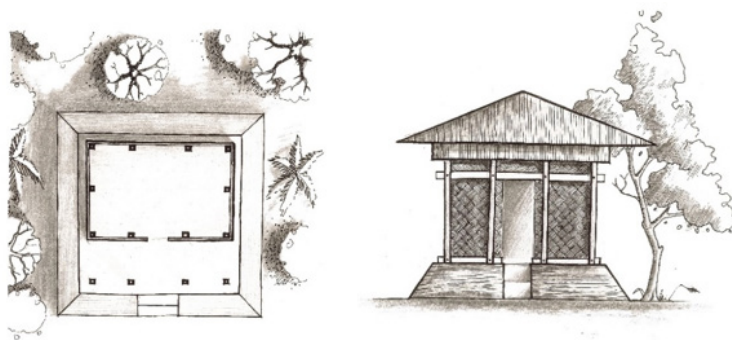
Plan and Elevation of BRAC Shelter (Source: Shelter Cluster)
